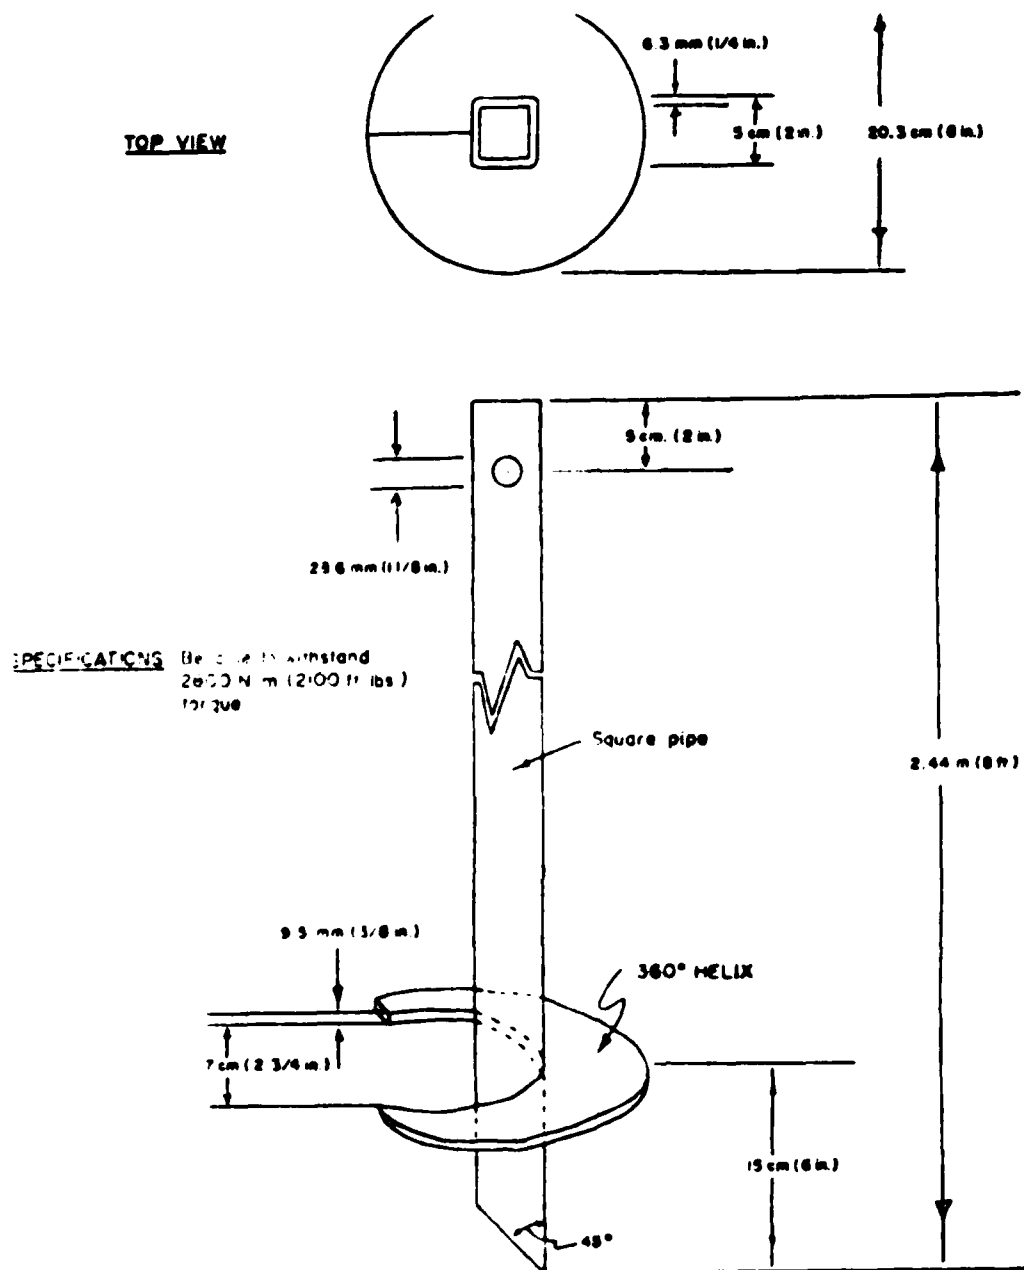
Helix pipe, 1983 replacement for iron pipe with cap (type 3). This marker is driven into the ground with the use of an articulated hydraulic power driver installed at the end of a 20-ft boom section. The top of a rounded benchmark serves as datum point.
